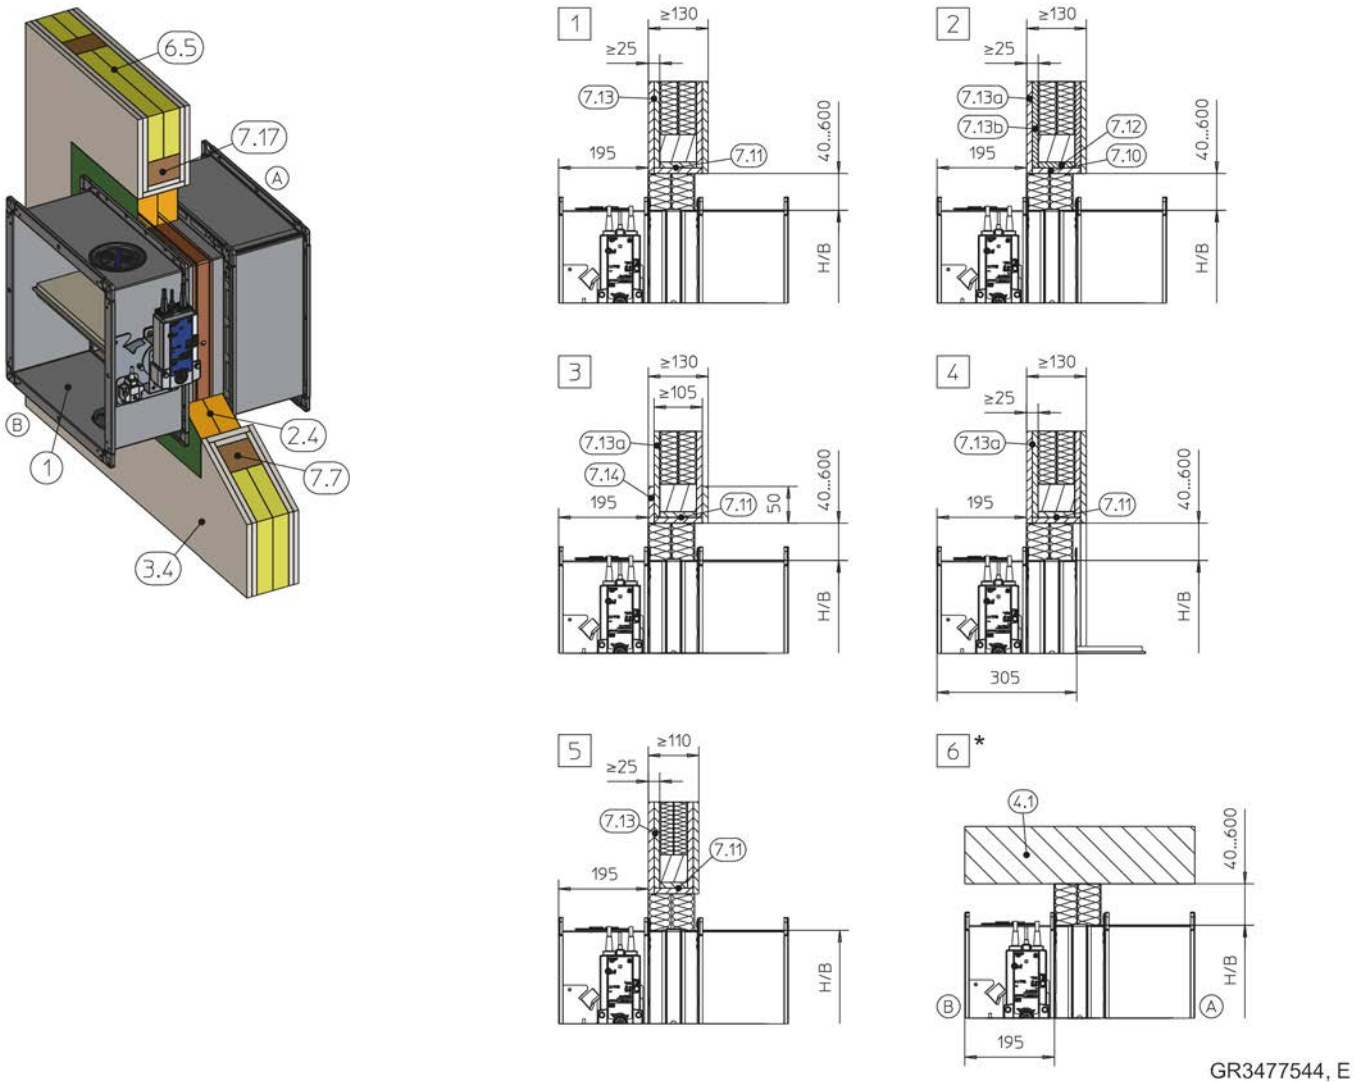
Dry mortarless installation into a half-timbered construction, with mineral wool
